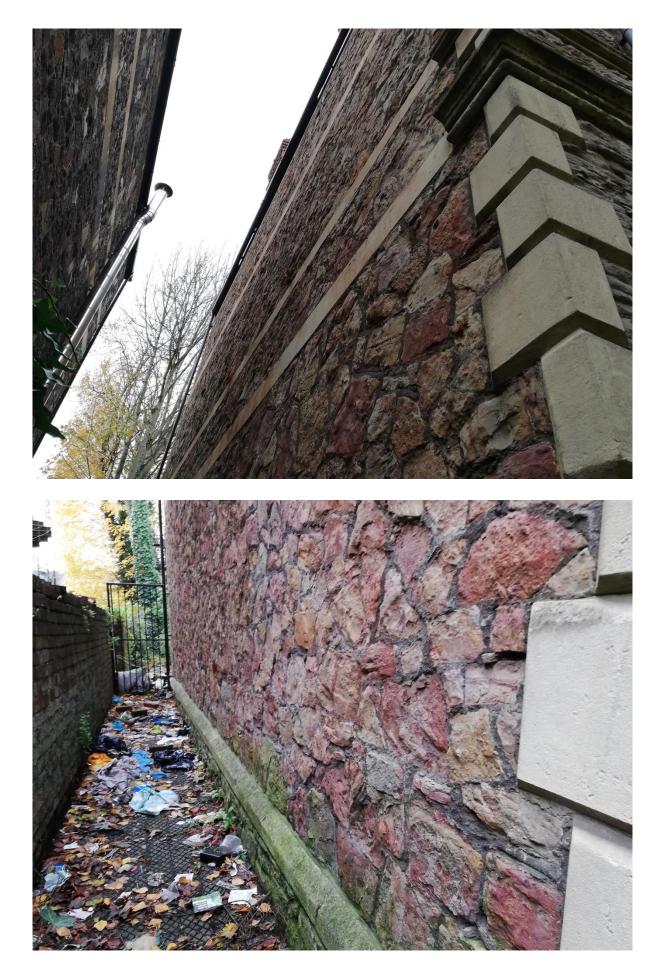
S elevation of 29 Cathedral Road, showing variety of stone use and coursing with brick chimneys
